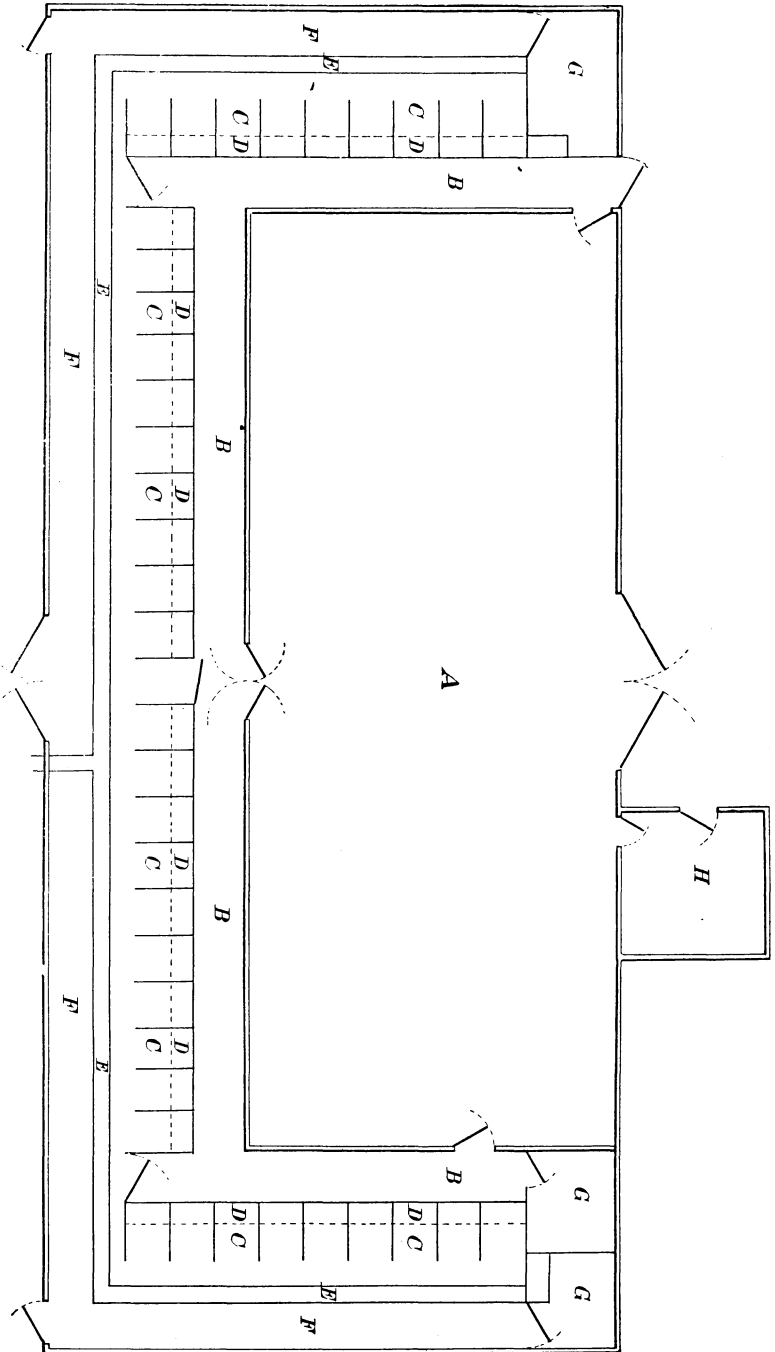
Ground floor plan of dairy barn: *A*, main barn for storing and preparing feed, etc.; *B*, feeding alleys; *C*, stalls; *D*, mangers; *E*, manure gutter; *F*, passage-way; next to outside wall for use in cleaning stable, etc.; *G*, box stalls; *H*, milk room.
